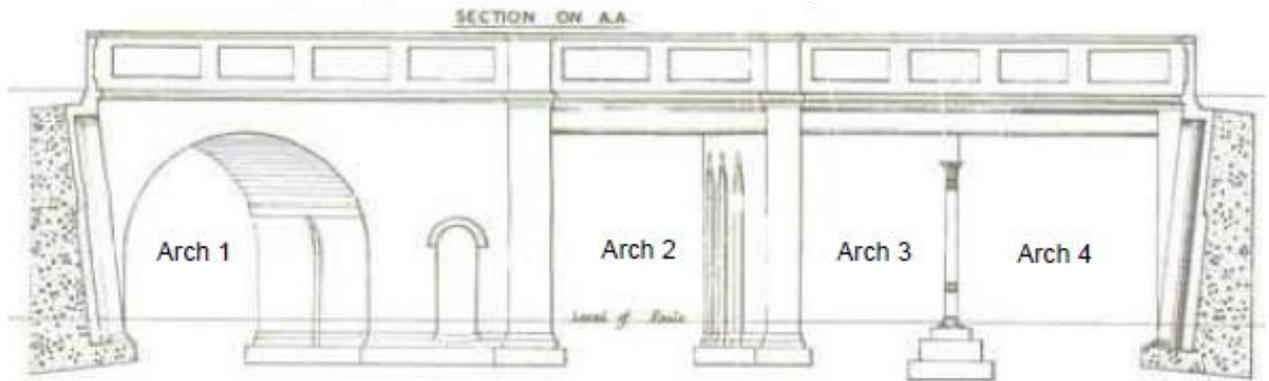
View on west elevation of original bridge (looking east). Arch 5 not shown in above illustration.
